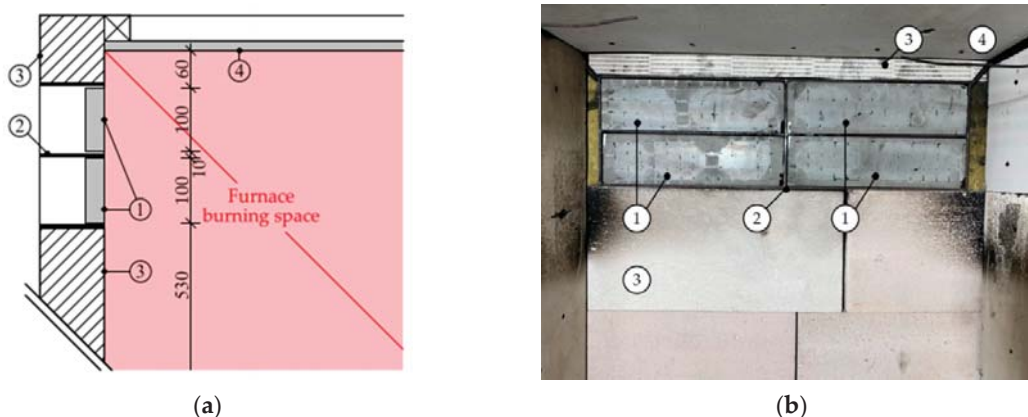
Scheme of the position of the test specimens: (a) side view on the specimen placements; (b) view from inside the furnace of the placed test specimens Legend: 1—exposed side of the test specimen; 2—steel construction holding test specimens; 3—furnace front wall from aerated concrete blocks thickness 100 mm; 4—ceiling of the furnace.
